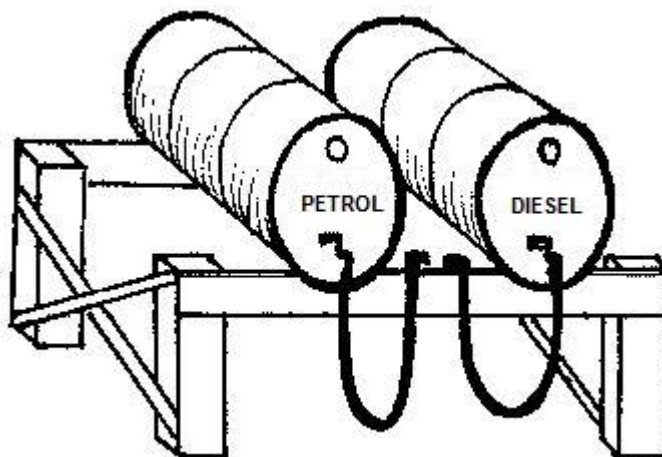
Typical installation of elevated horizontal fuel tank storage (Source: Africoast)
